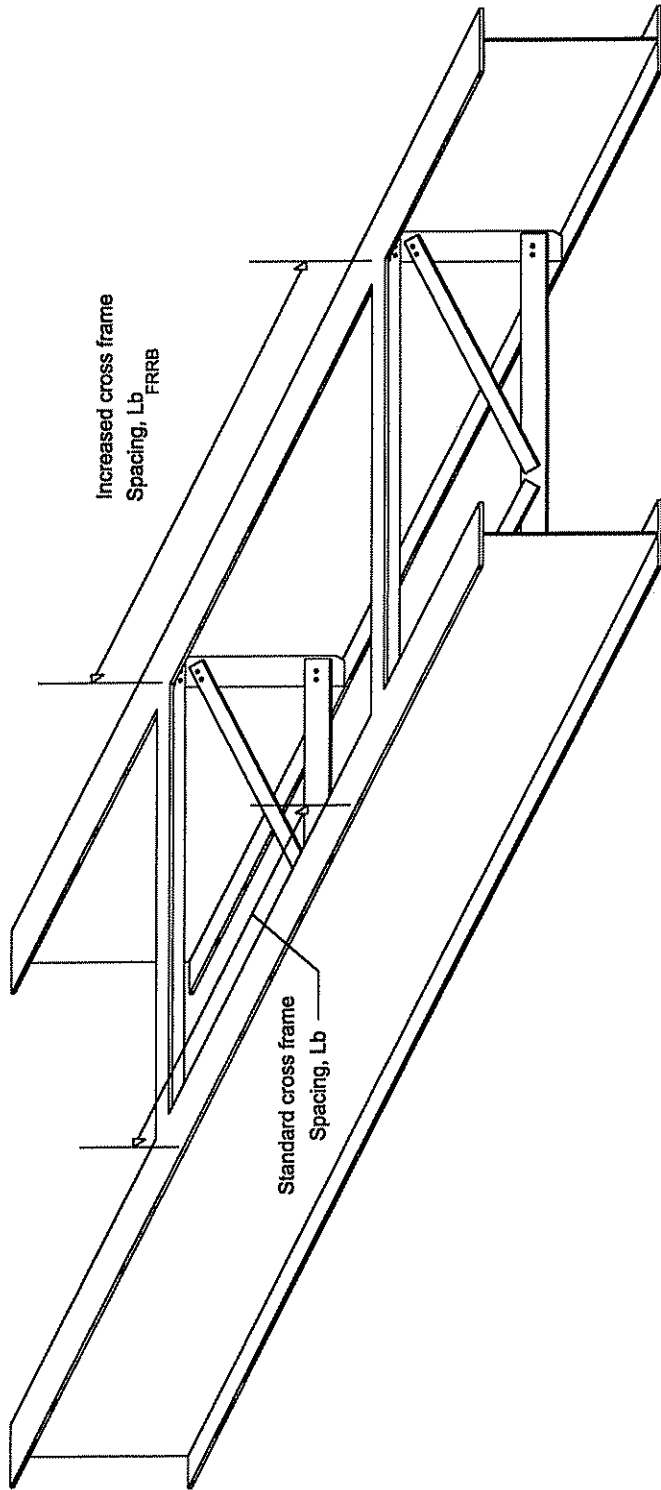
Pair of adjacent girders with cross-frame and flange rotational restraint brace
